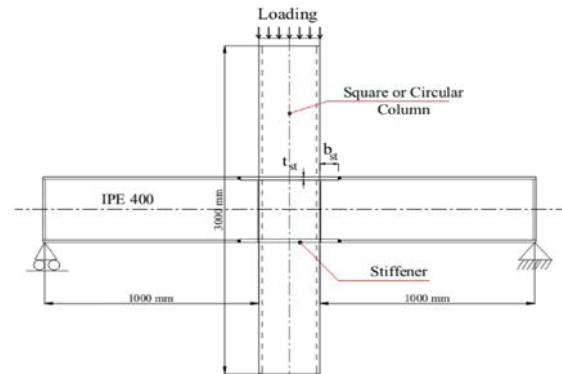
Schematic drawing showing steel I-beam to CFT column connection with loading and support conditions
